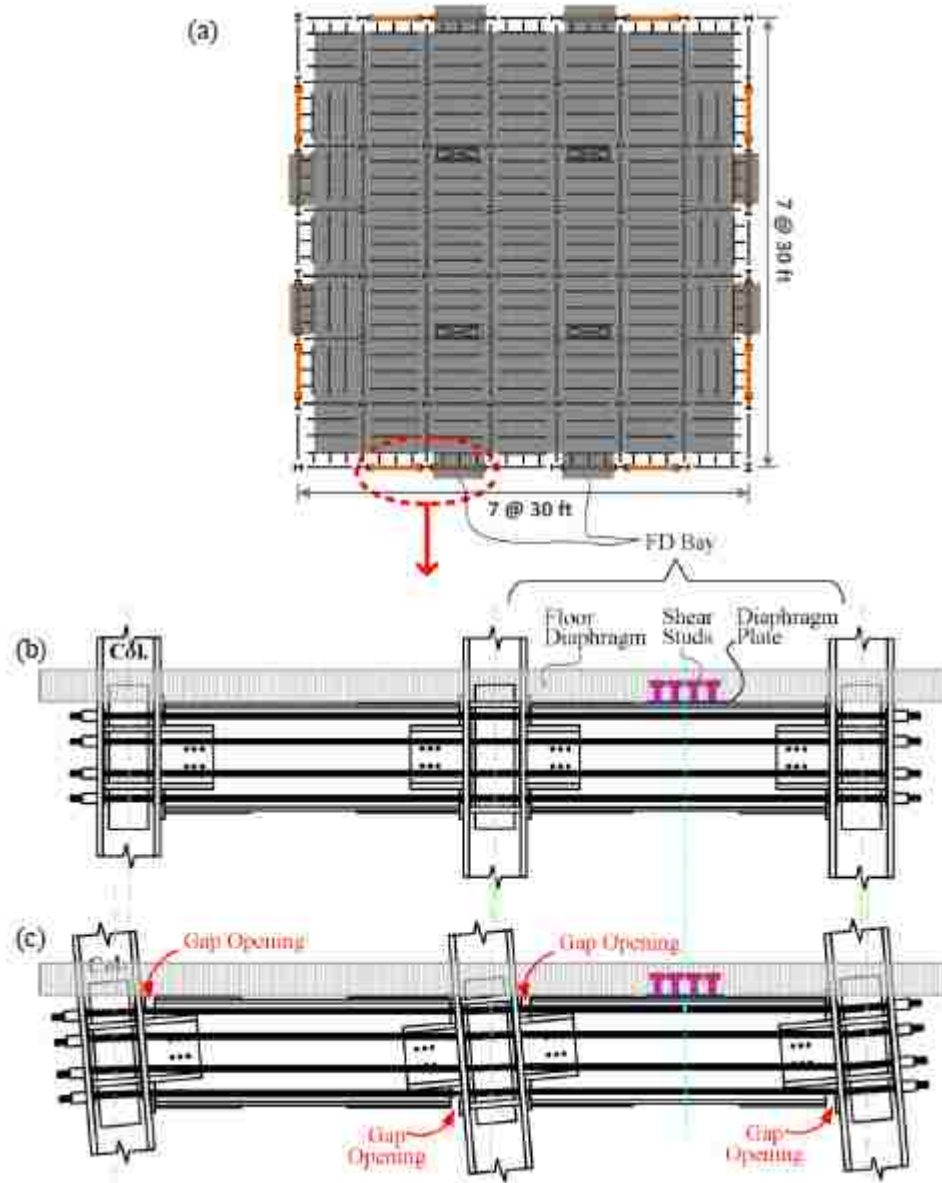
2. Schematic of the SC-MRF: (a) plan, (b) elevation without gap opening, and (c) elevation with gap opening at beam-column interface (Lin (2012)).
